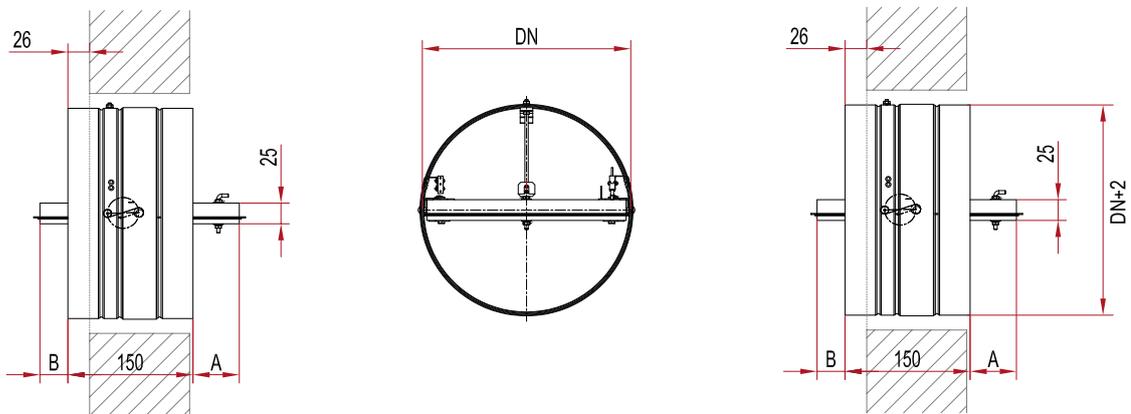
KTM...-M damper (with a spring mechanism, sleeve connections).
